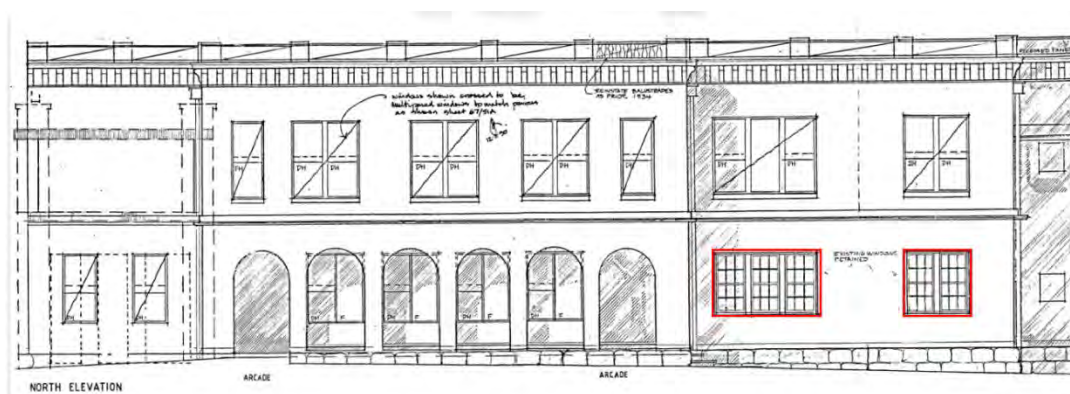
Plan showing reconstruction of the Powell Wing (northern façade). The surviving original windows are outlined in red. (Source: McGlashan & Everist & Daryl Jackson 1990 with GML Heritage overlay)
